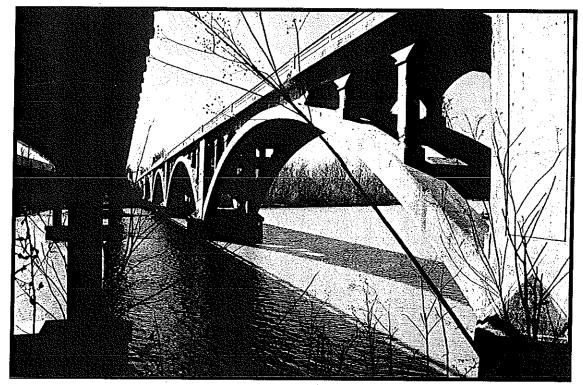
Looking southwest toward downstream elevation of Wilcox Bridge. US 29 Bridge at left.
